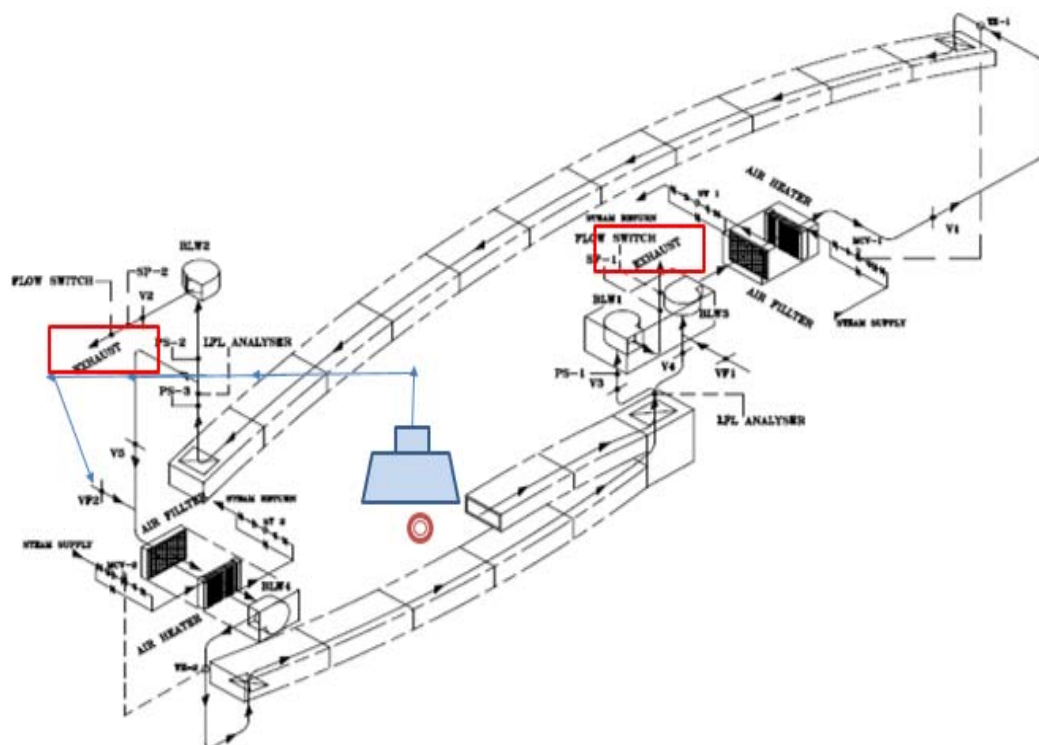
The local exhaust ventilation of the adhesive coating machine
